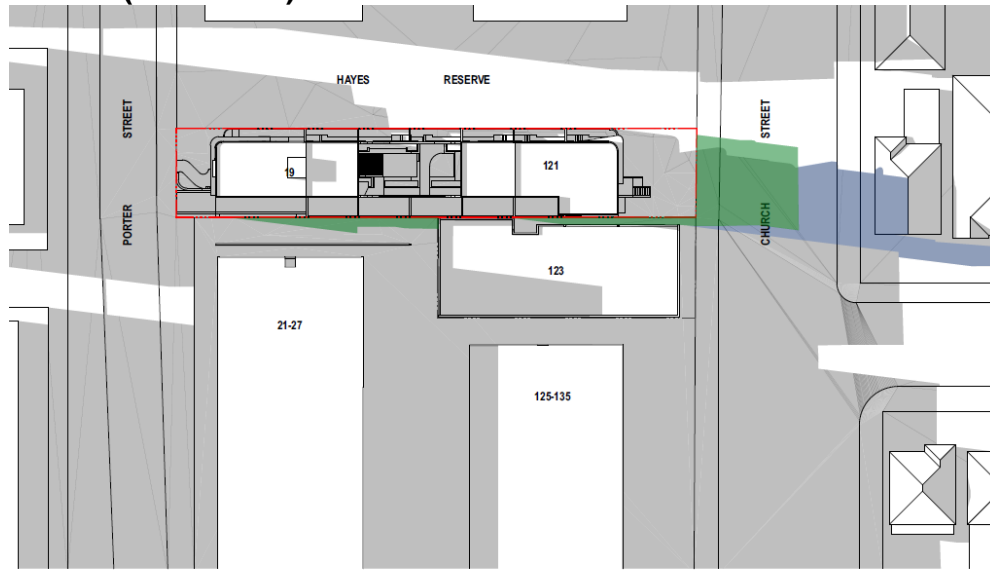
Shadow diagram of overshadowing at 12 noon from subject site with shadows from the existing buildings (green) and proposed development (blue).
